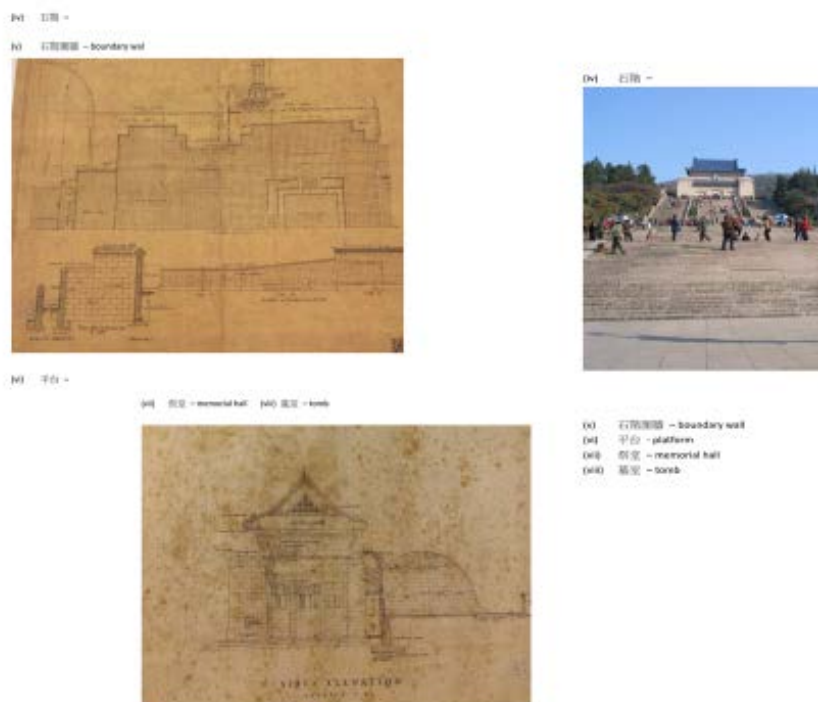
Pavement, Platform, Surrounding Wall and Tomb of the Mausoleum
